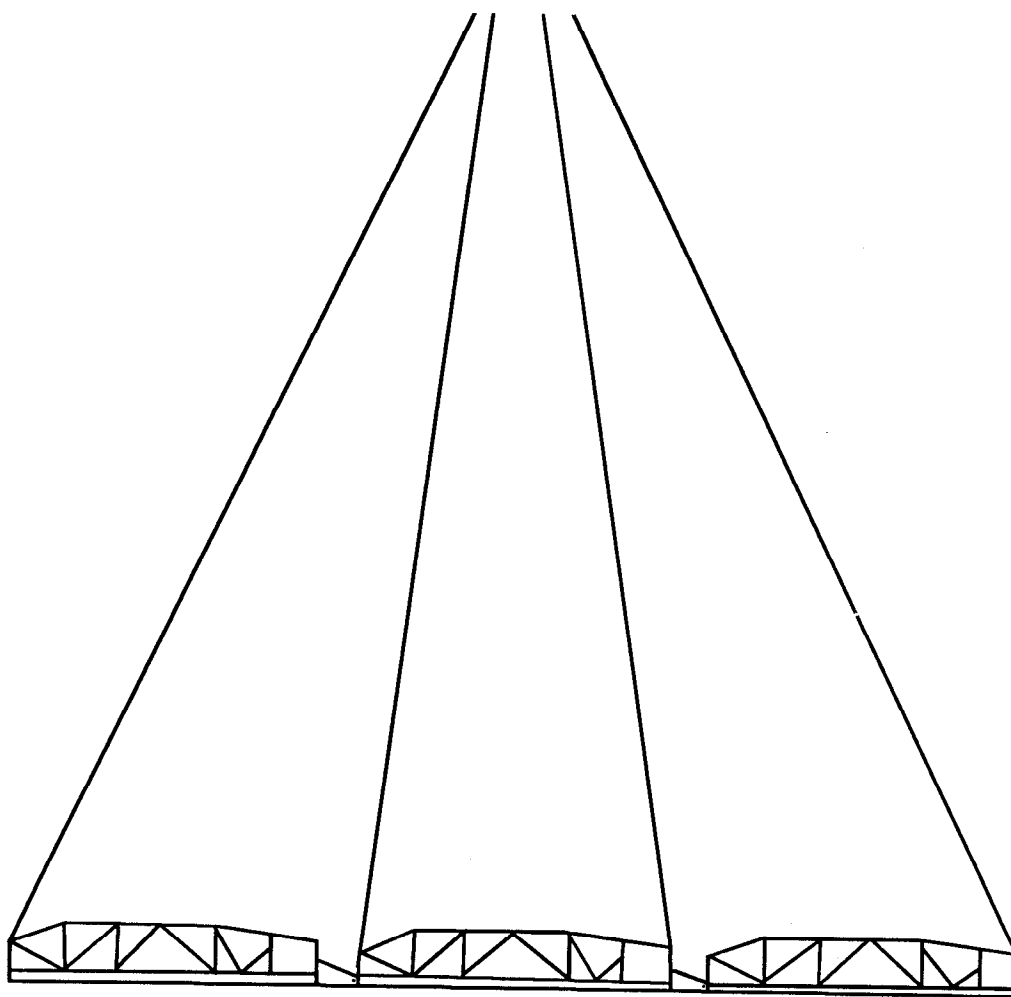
Arrangement of suspension slings for a three platform assembly
